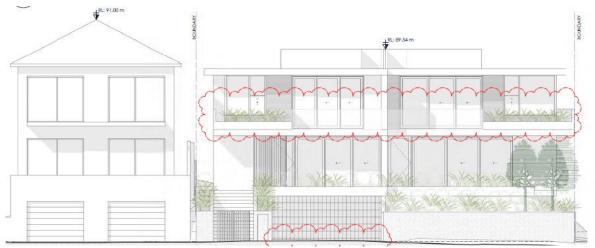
Height of the proposal is significantly below the neighbouring dwellings ridge height as demonstrated on the Military Road Elevation (Source: Pinnacle, 2021)
